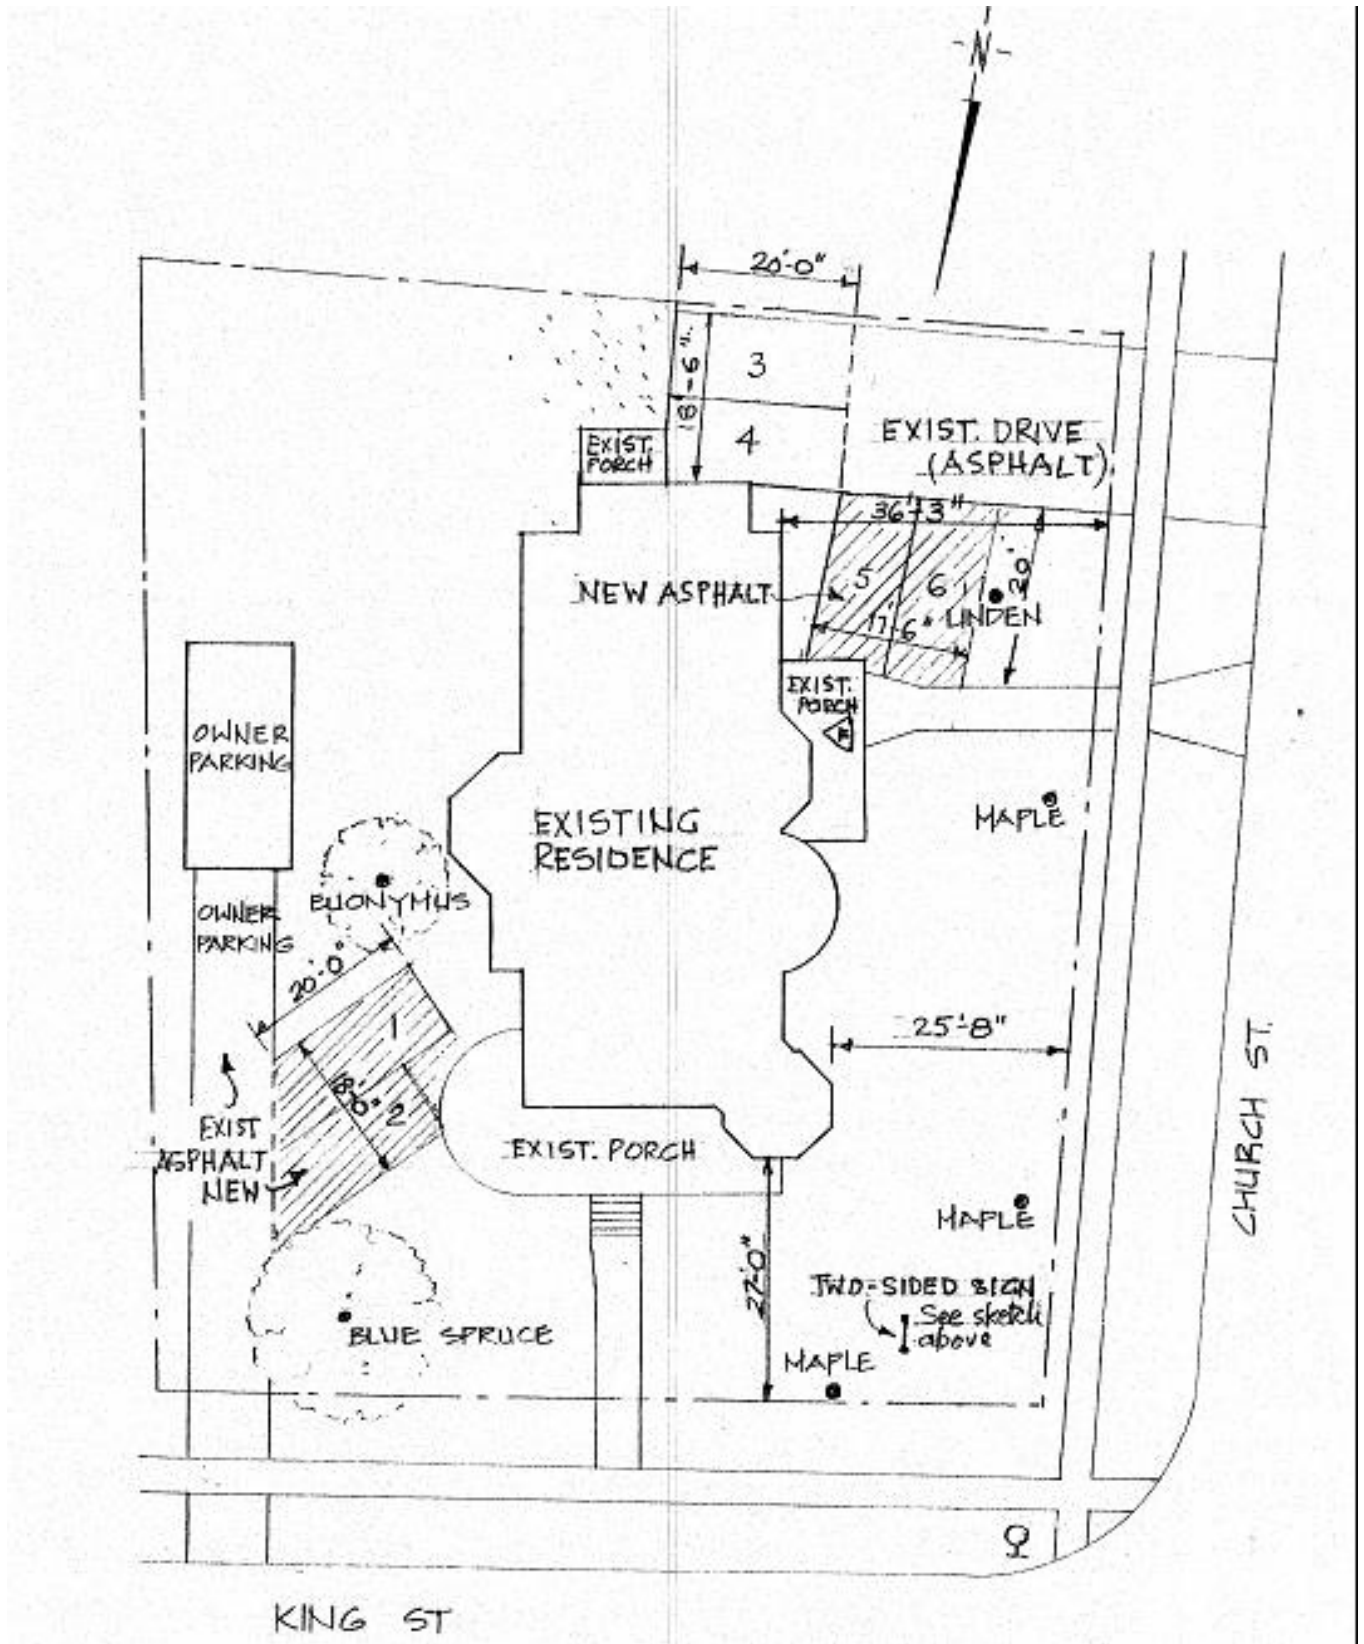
95 King St. W., Gananoque, site plan (Inglis and Downey architects, 1997).
